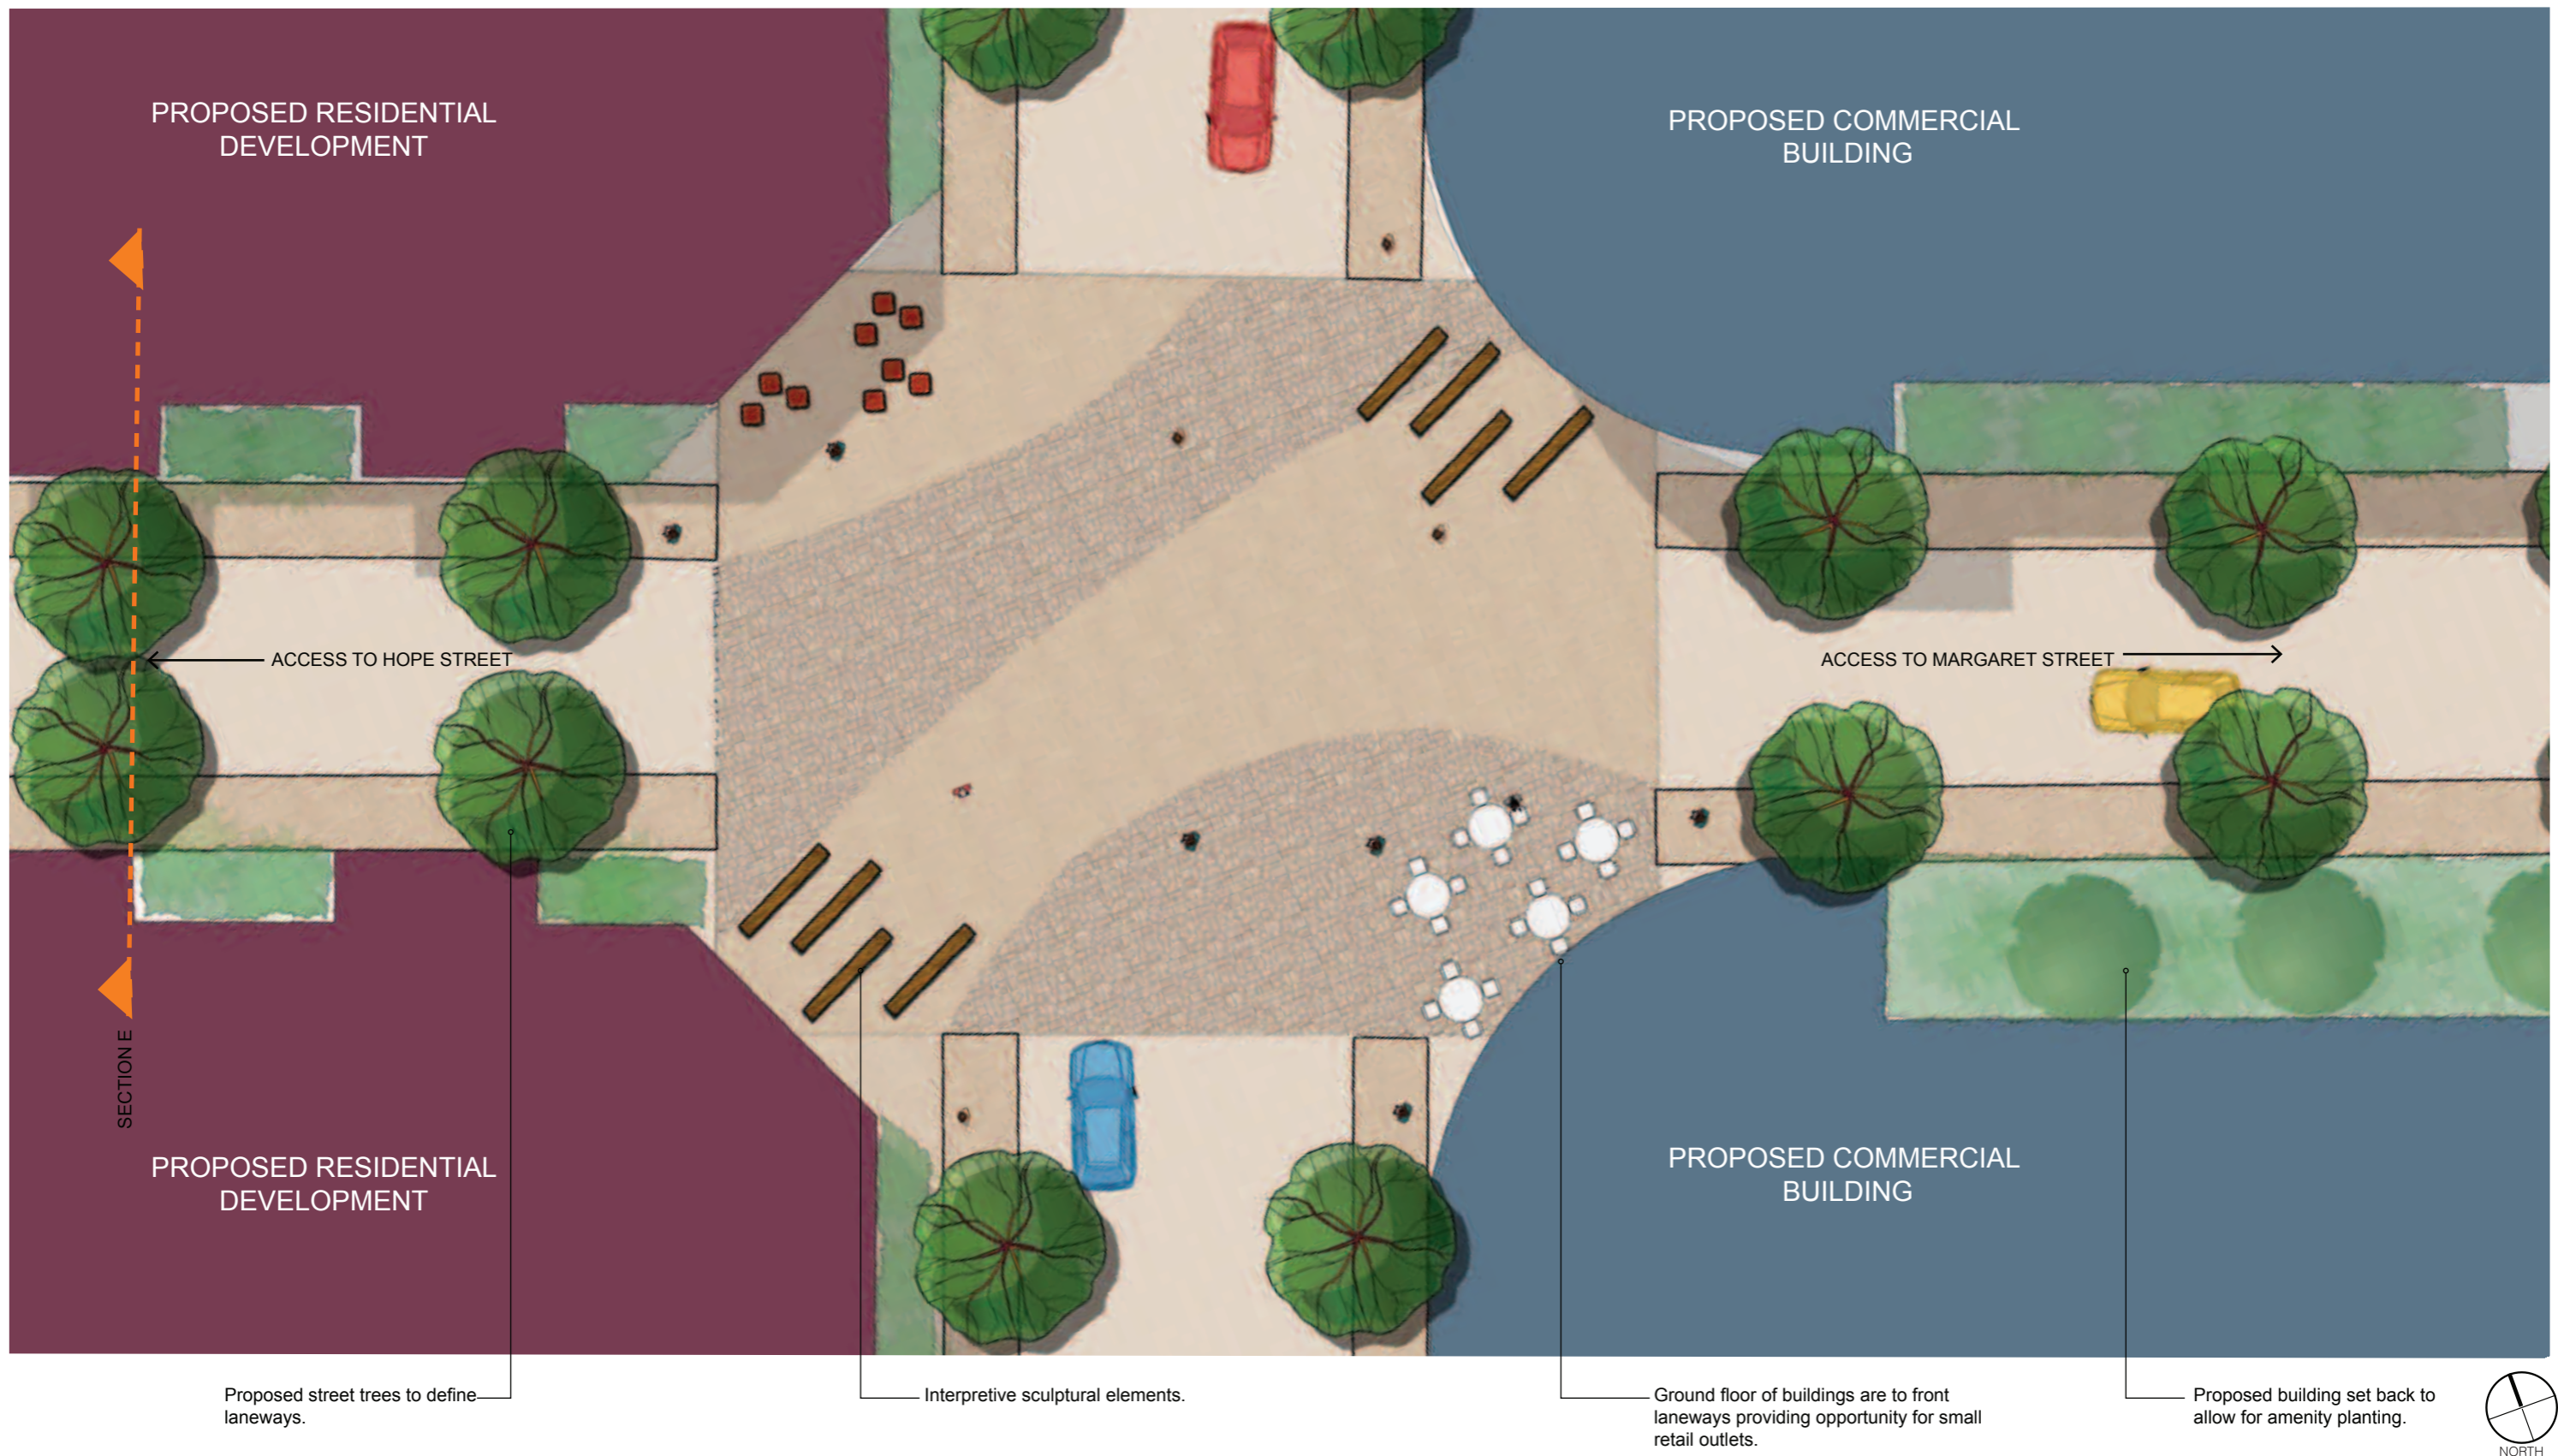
PROPOSED LANEWAY NODE CONCEPT PLAN
